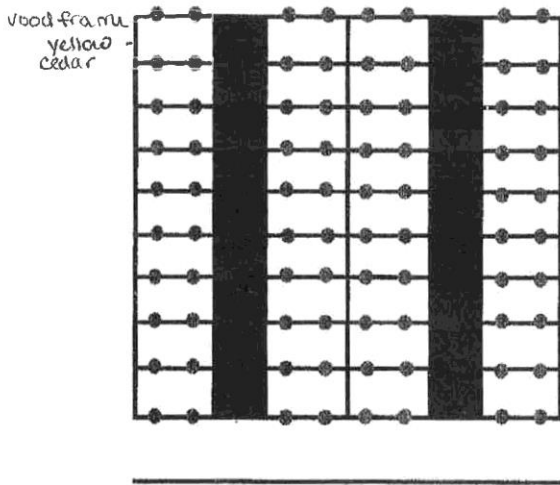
Cross-Sectional Diagrams and Drawings For Grow out Rafts not to scale
